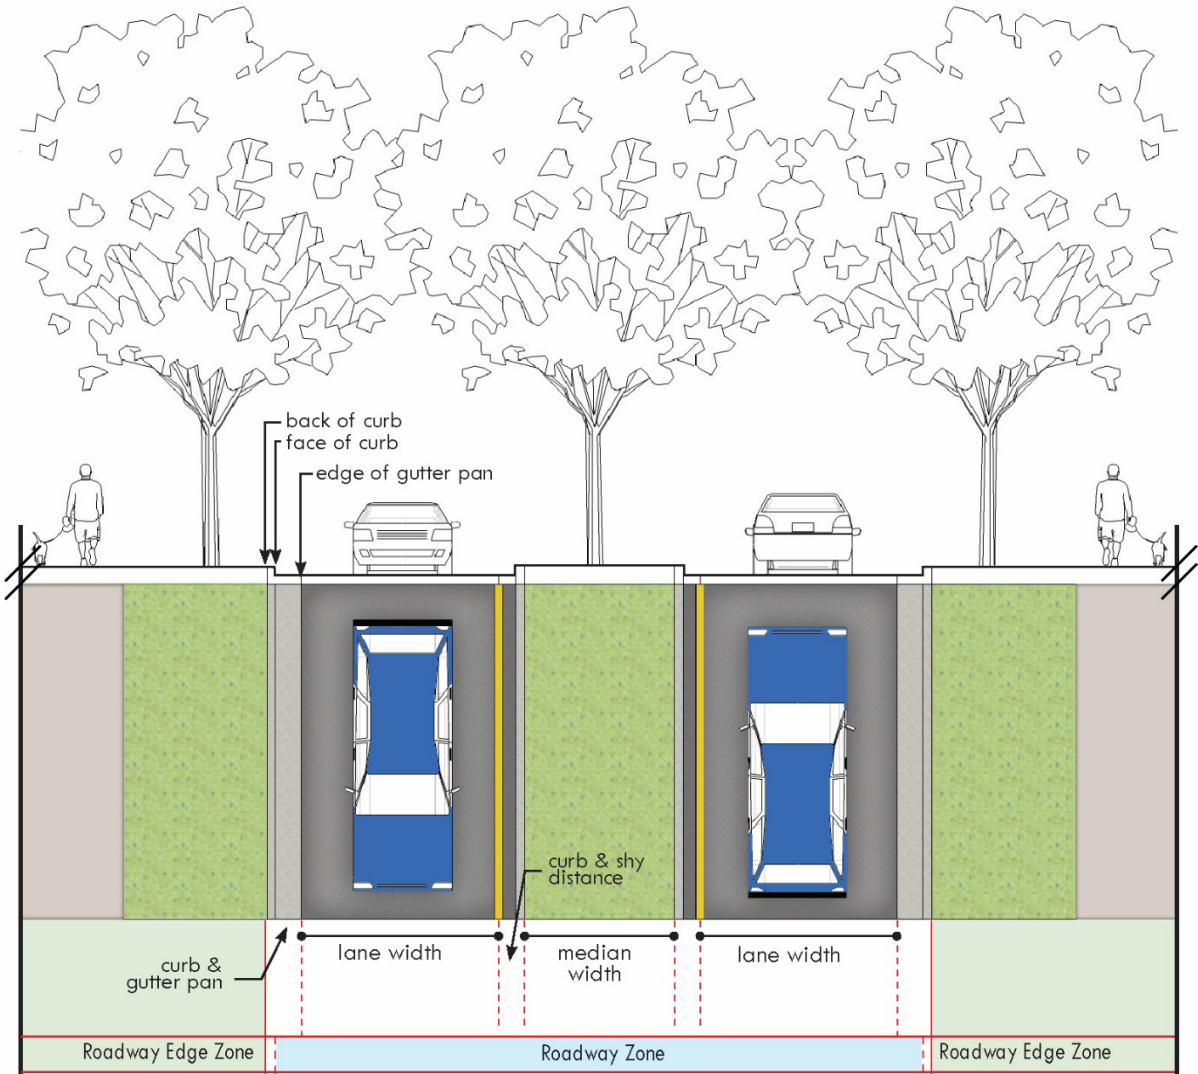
Roadway Zone Cross-Section with No Bicycle Lanes and No On-Street Parking. When the travel lane is adjacent to the curb and gutter, the travel lane width does not include the width of the gutter pan.
